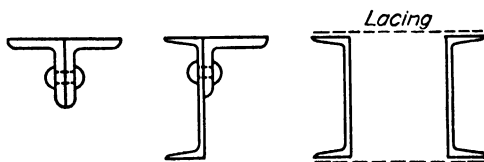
SECTIONS FOR LIGHT STRUTS.
